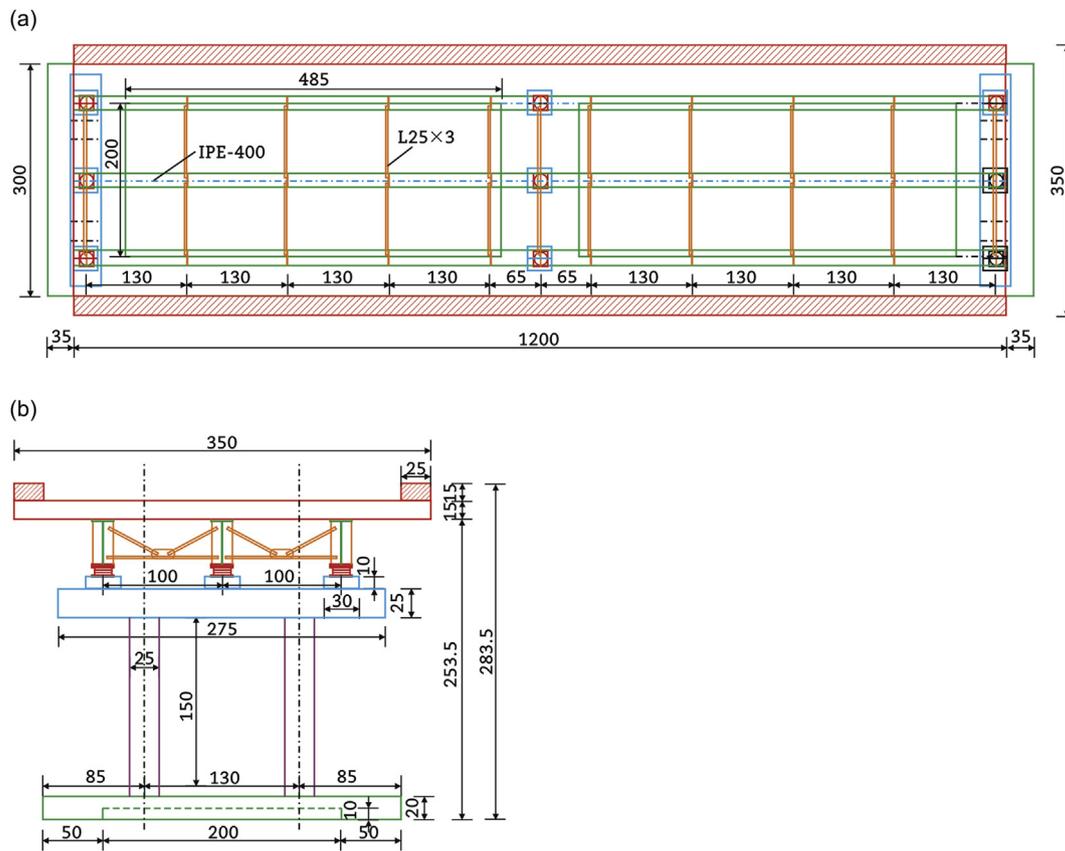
Test bridge design (unit: cm). (a) Plan. (b) Cross-section.
